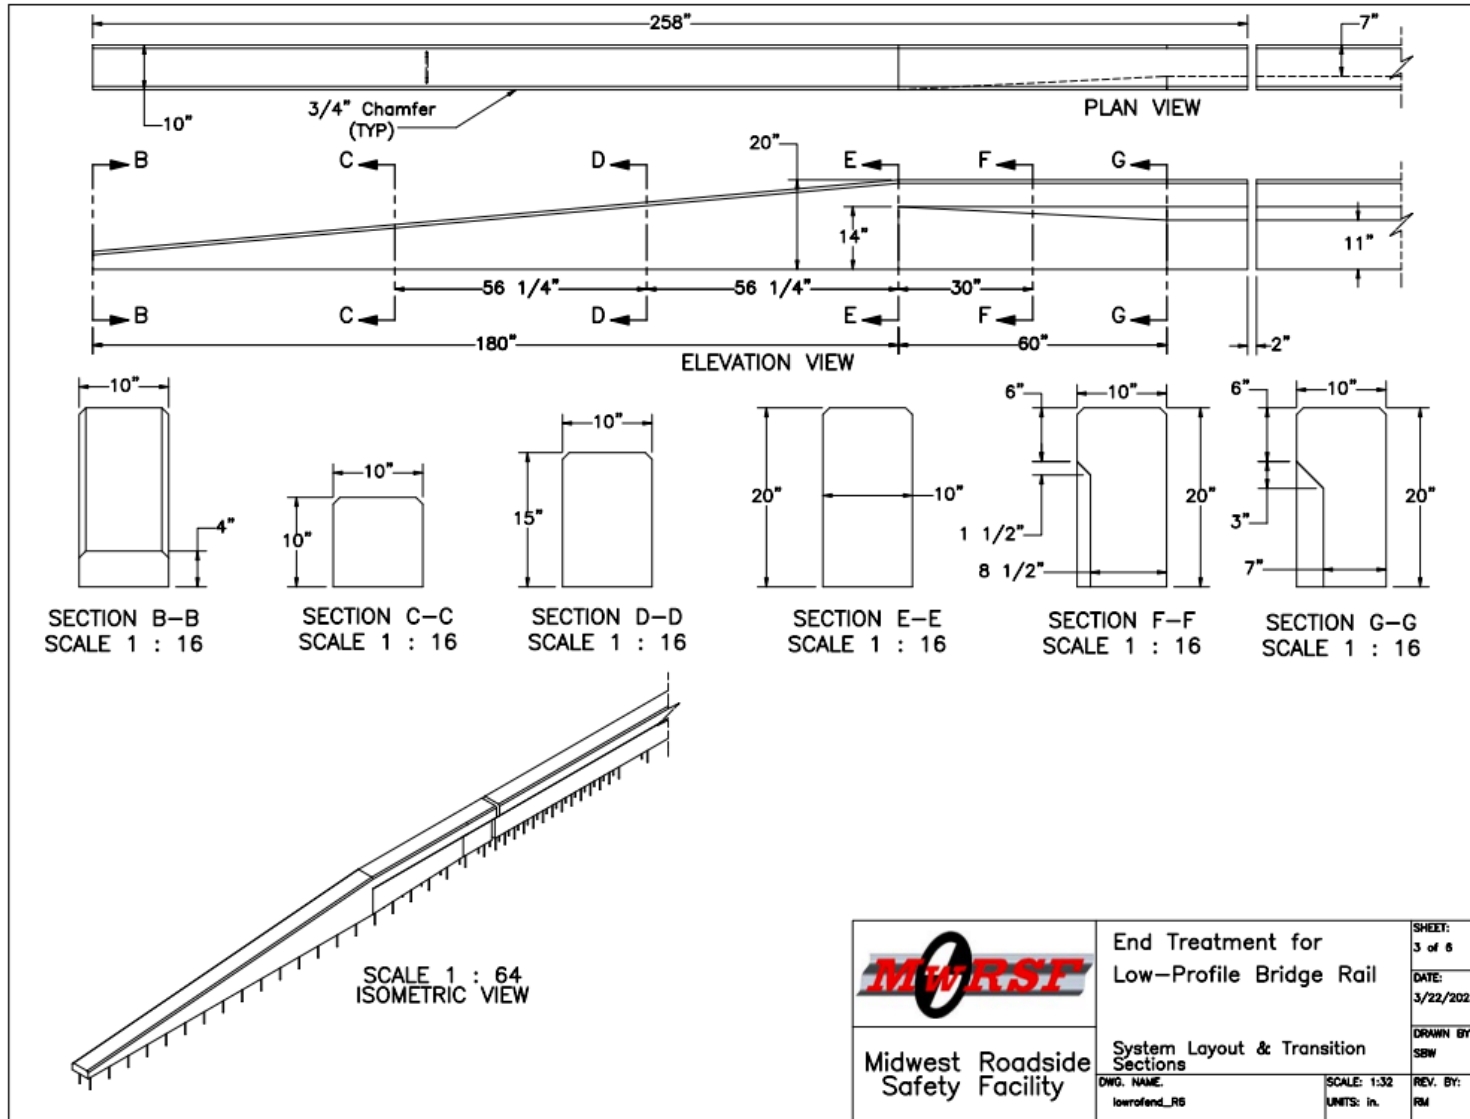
Modified NDOR Bridge Railing System, System Layout and Transition Sections
